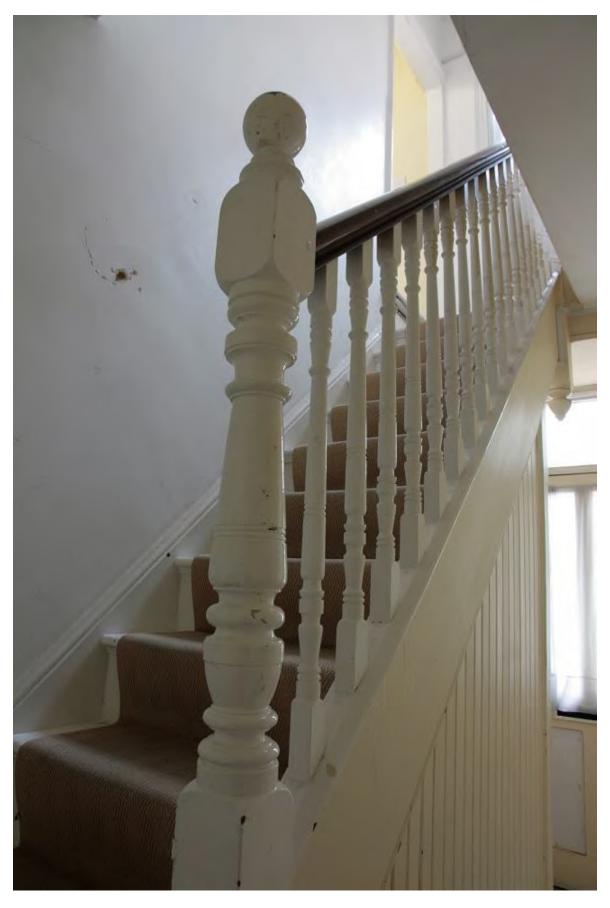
Newel post and balustrade of stairs to first floor, looking east-southeast (LMSC16 D100 (70))
